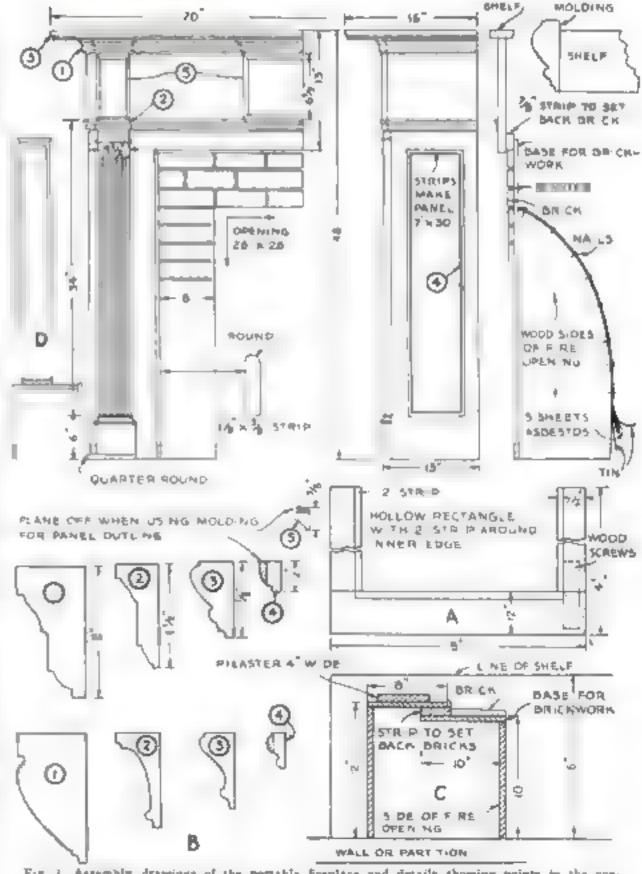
Assembly drawings of the portable fireplace and details showing points in the construction. Four afternate designs, having bearths, are shown in the shetches on page 100
